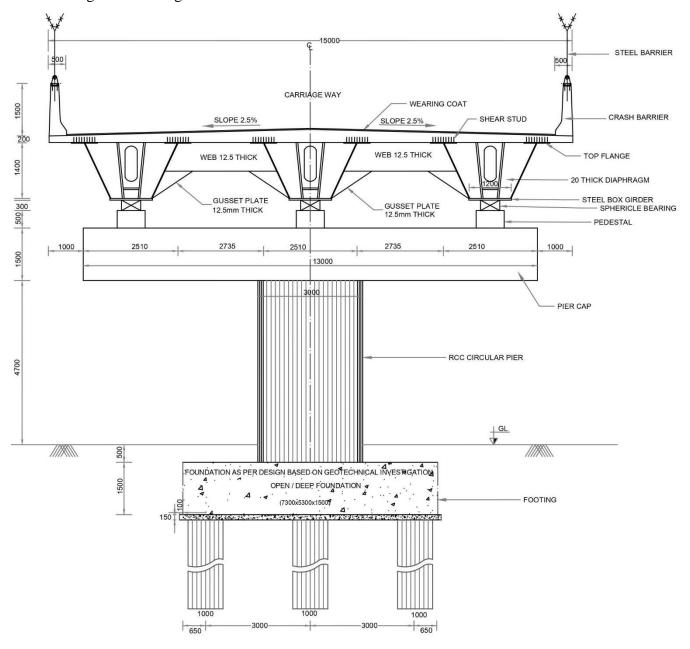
Sectional cross section of Trapezoidal box girder for 48m span
